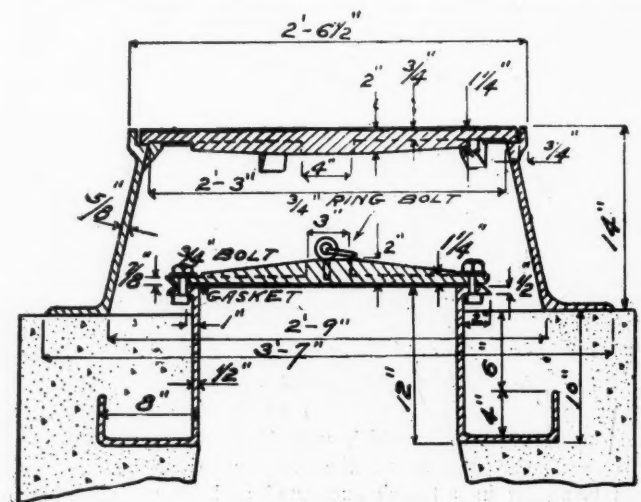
SECTION OF WATER-TIGHT MANHOLE HEAD
